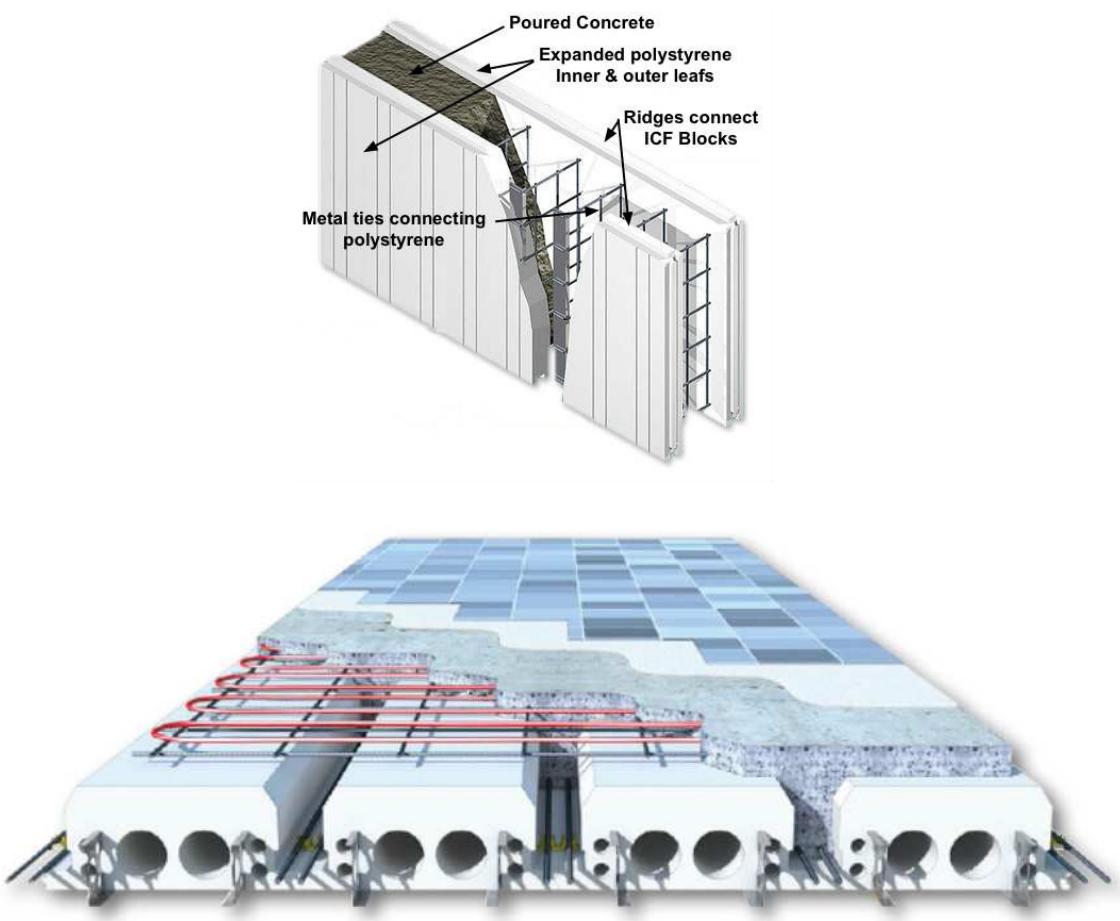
Insulated Concrete Formwork (ICF) sections and illustrations
